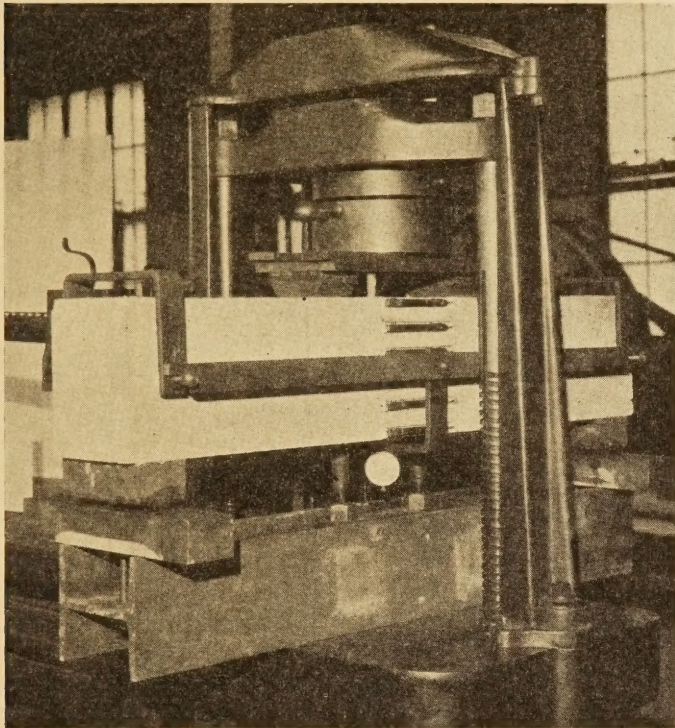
CONCRETE BEAM IN TEST MACHINE READY FOR STATIC TEST SHOWING ARRANGEMENT OF DEFLECTION GAGE AND GRAPHIC STRAIN GAGES
